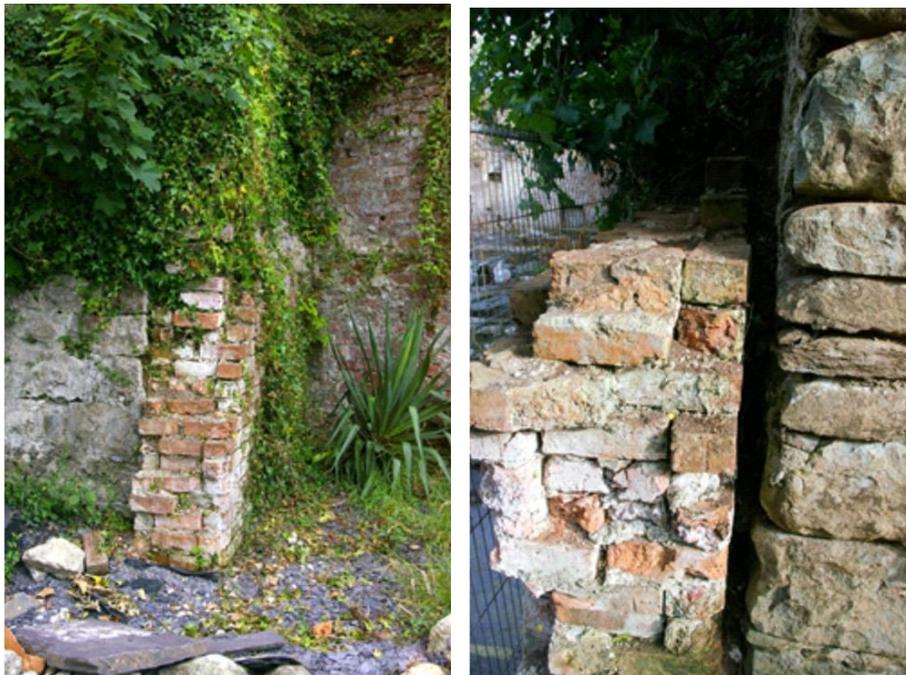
(left): Remains of the bridge support wall, opposite A17 (2010)
